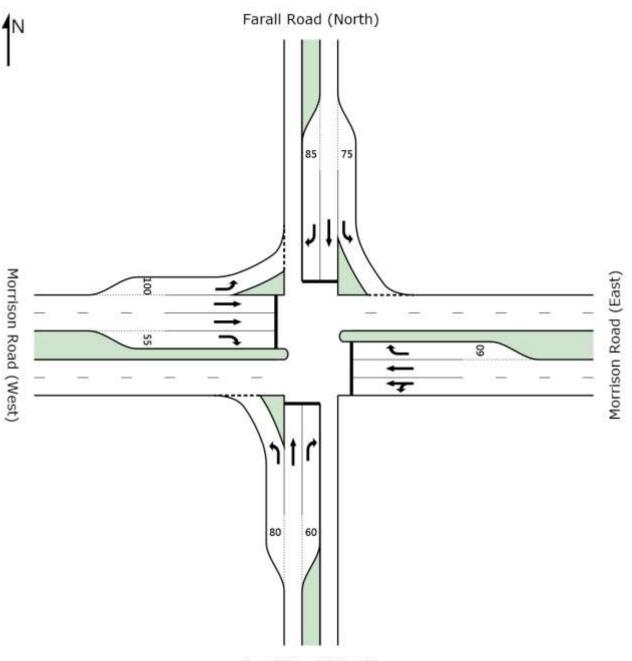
Proposed Intersection of Morrison Road and Farrall Road
